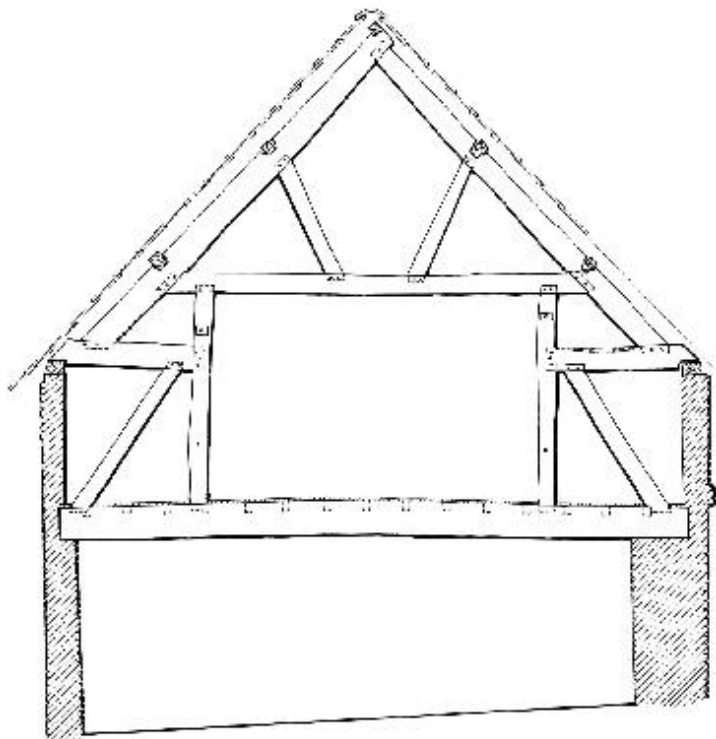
Gable elevation and cross-frame of the former Sack Warehouse on the south bank of the Wye: a good exemplar of a warehouse building with no architectural pretensions
